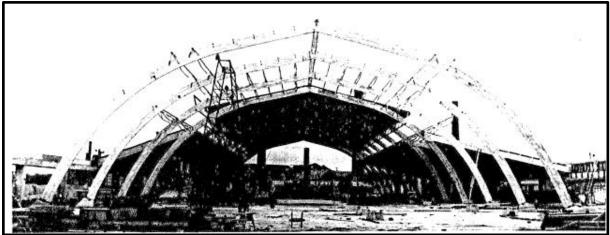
Arches under construction at Symonds St Peters Factory (Holland Street section), c1946. (Source: Nolan, 1994)
